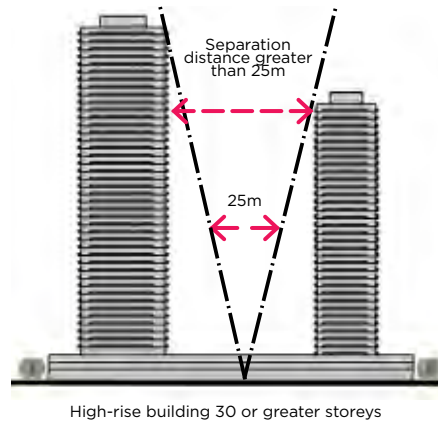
Section highlighting tower separation distance for high-rise Building with 30 or greater storeys
